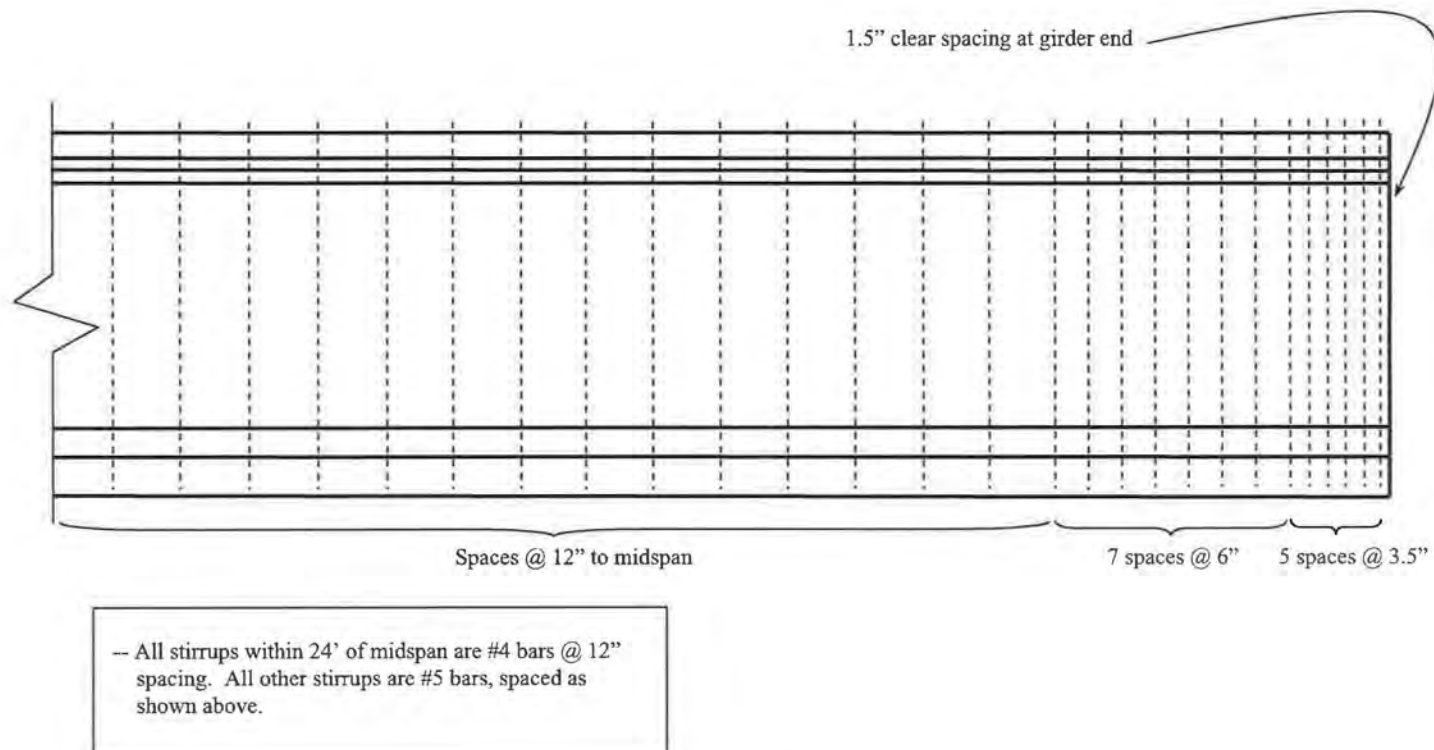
Location of Vertical Shear Reinforcement in a Typical BT54 Girder
